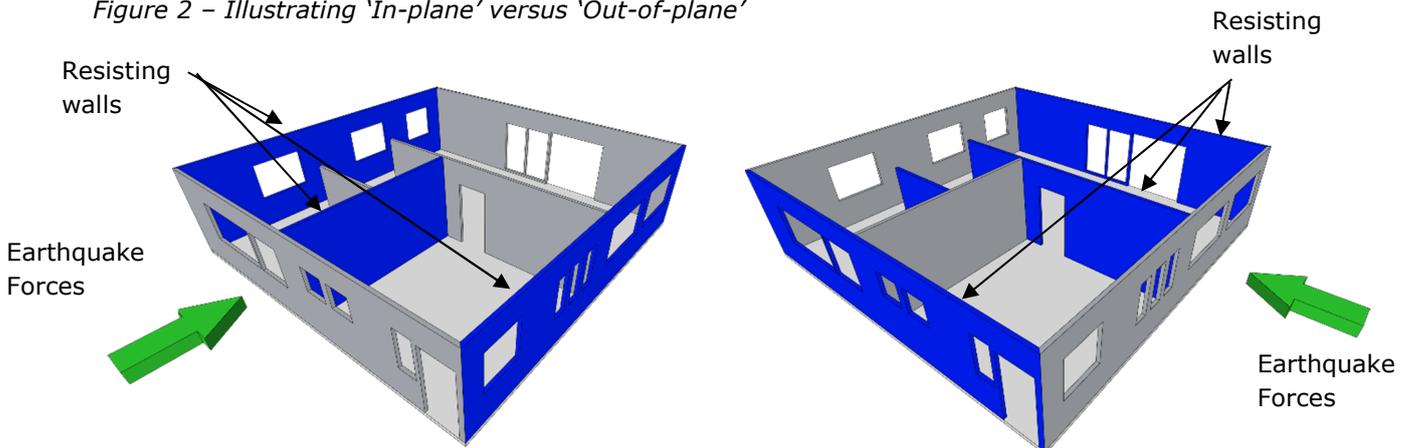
Earthquake forces on one direction – in-plane walls are blue, out-of-plane walls are grey
